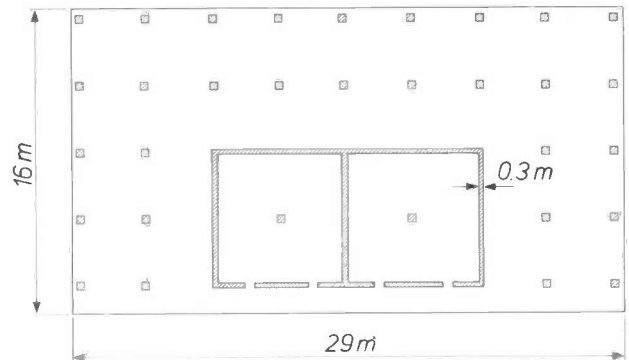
Horizontal cross-section through the columns and walls that connect the foundation floor and the floor for the wafer steppers. The two floors and the walls form a stiff concrete box construction.
